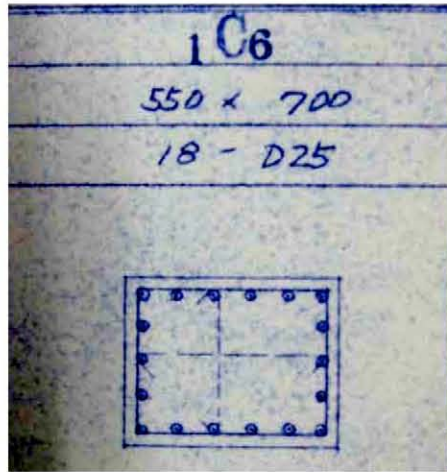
Column in first story of The Kashiwazaki High School, cross section and observed crack pattern (Site SP11, N37.3721°, E138.5569°).
